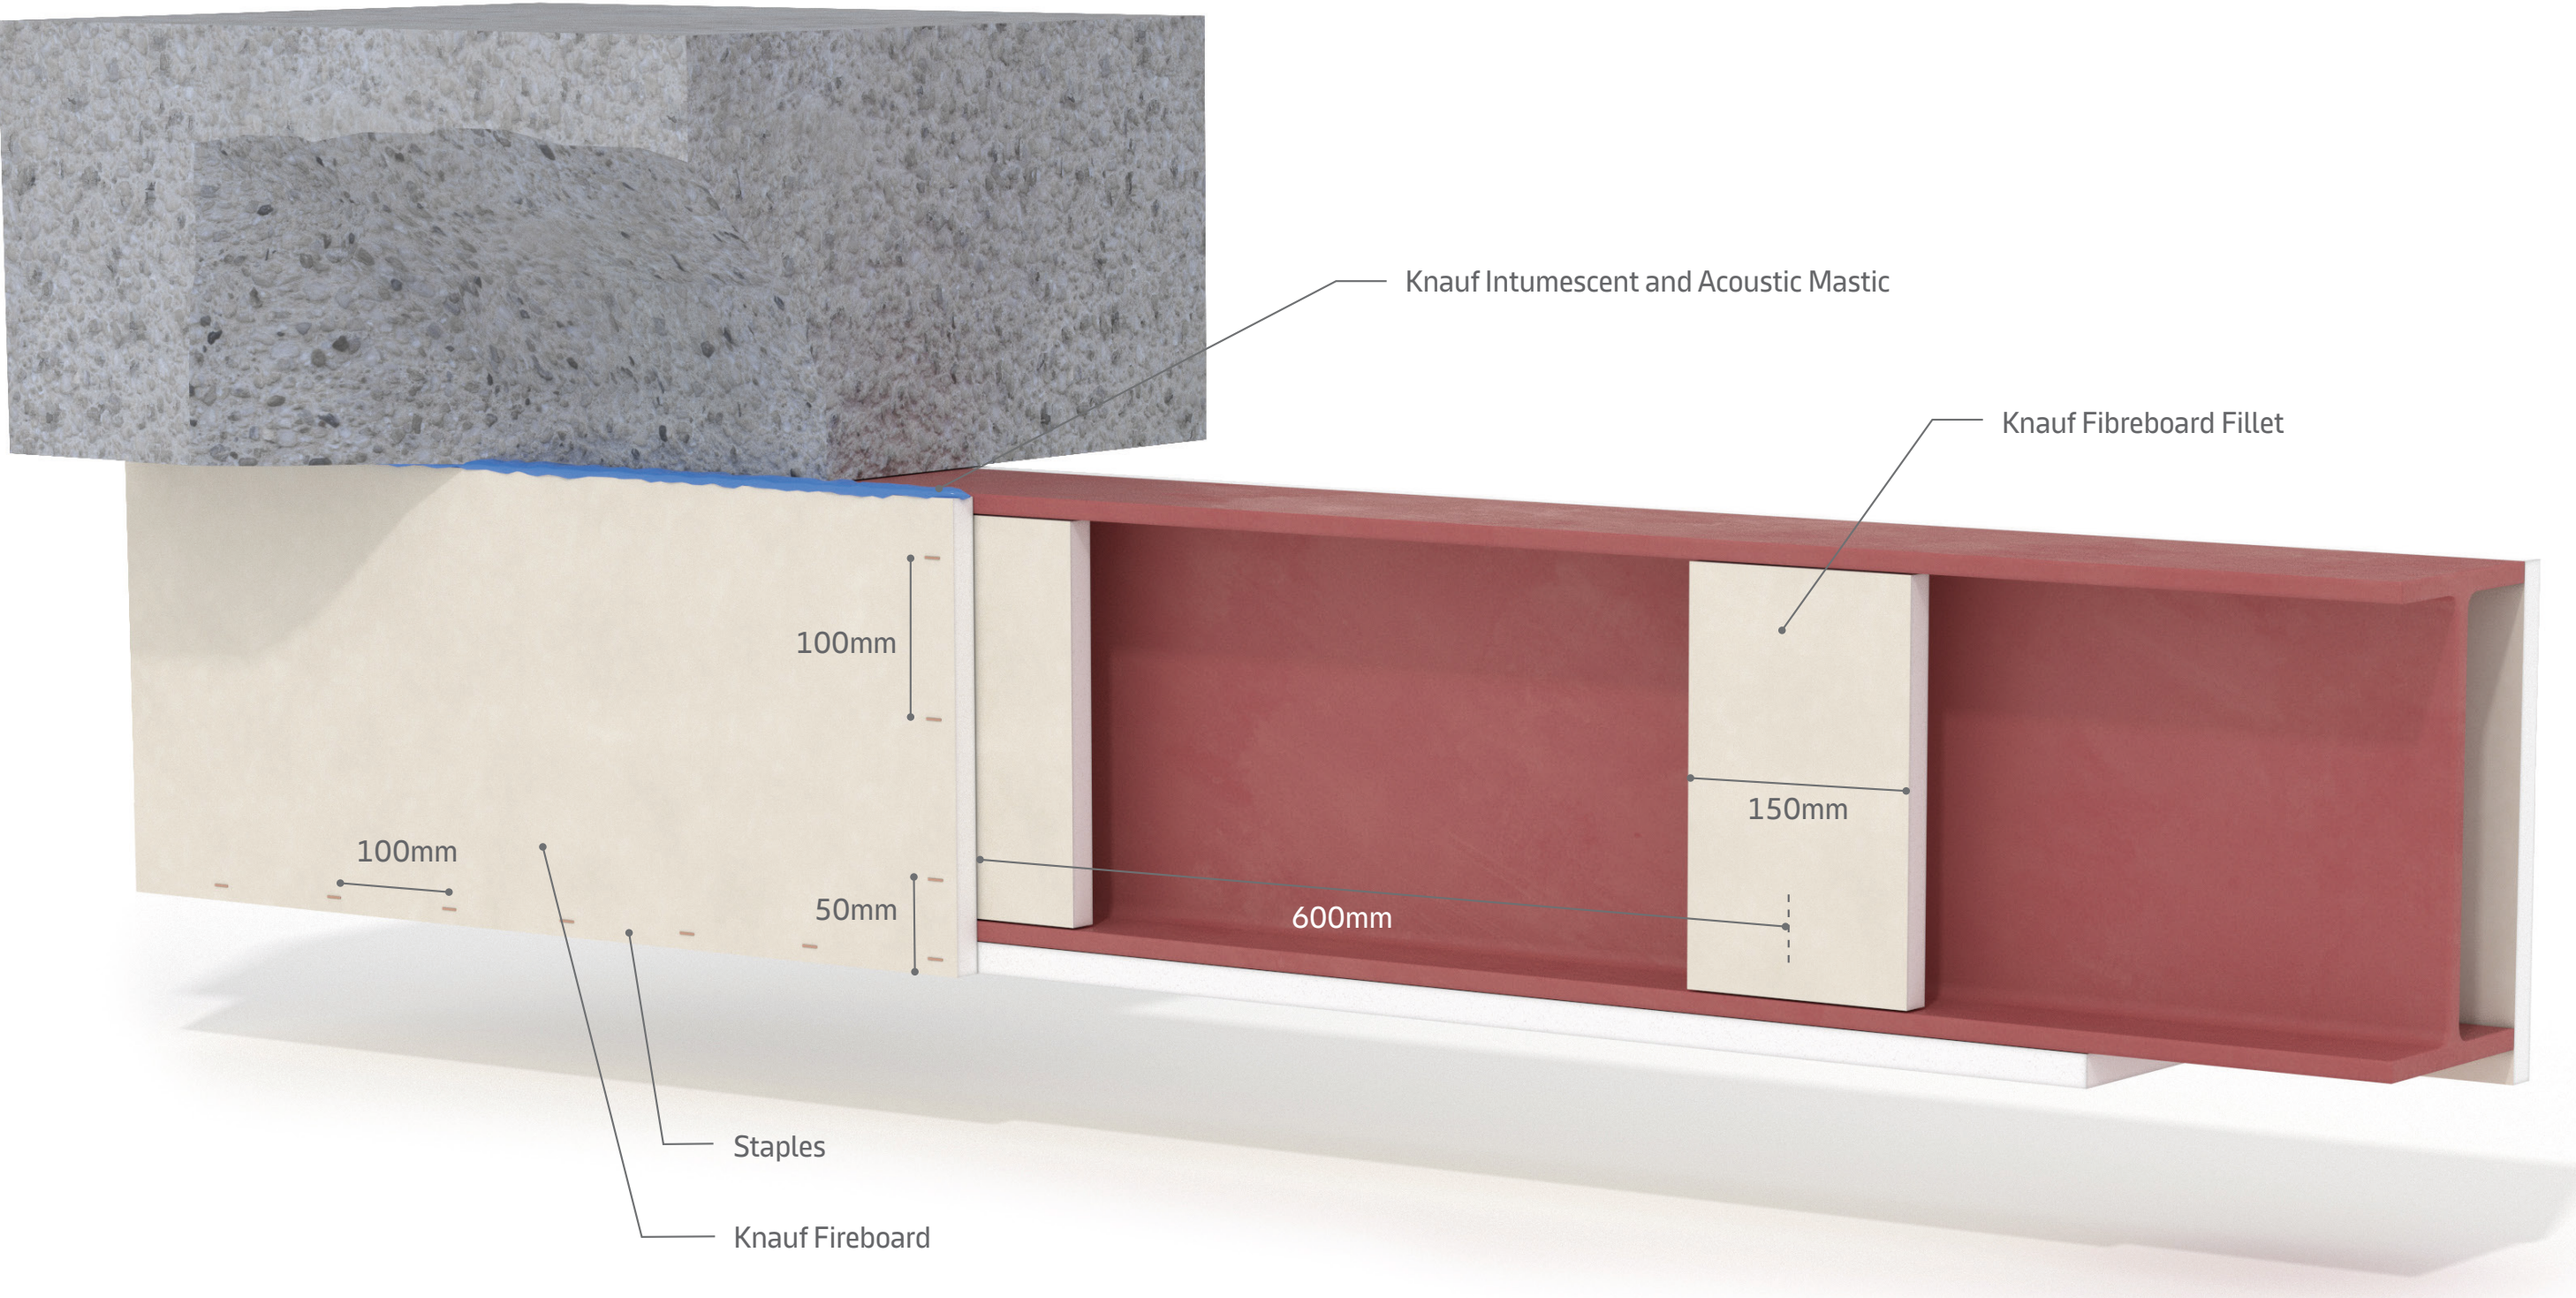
Isometric view of a 3-sided, single layer of Knauf Fireboard protecting Universal Steel Beam
